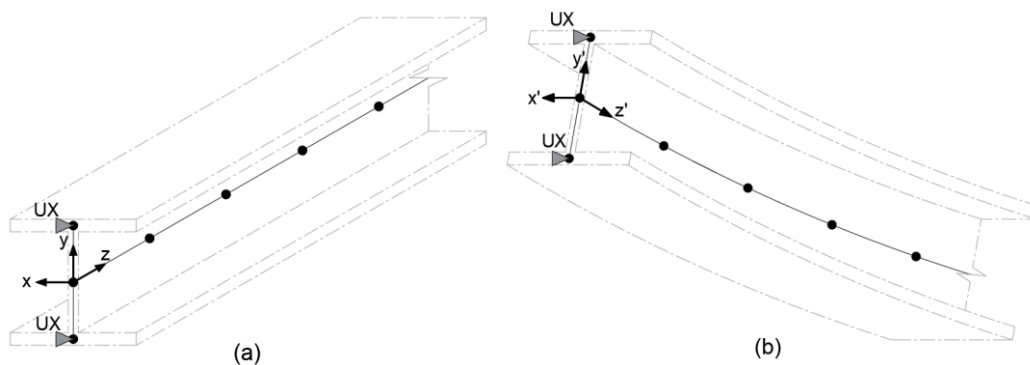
Support against local twisting rotation: (a) undeformed, (b) deformed.
